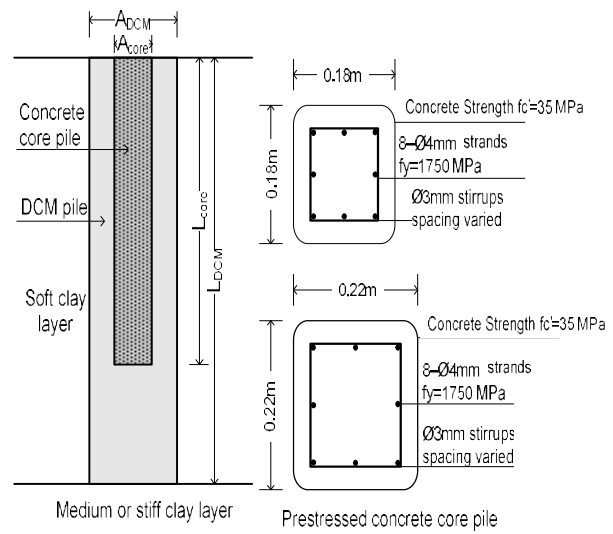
(a) Schematic of SDCM pile, (b) Details of prestressed concrete core piles
